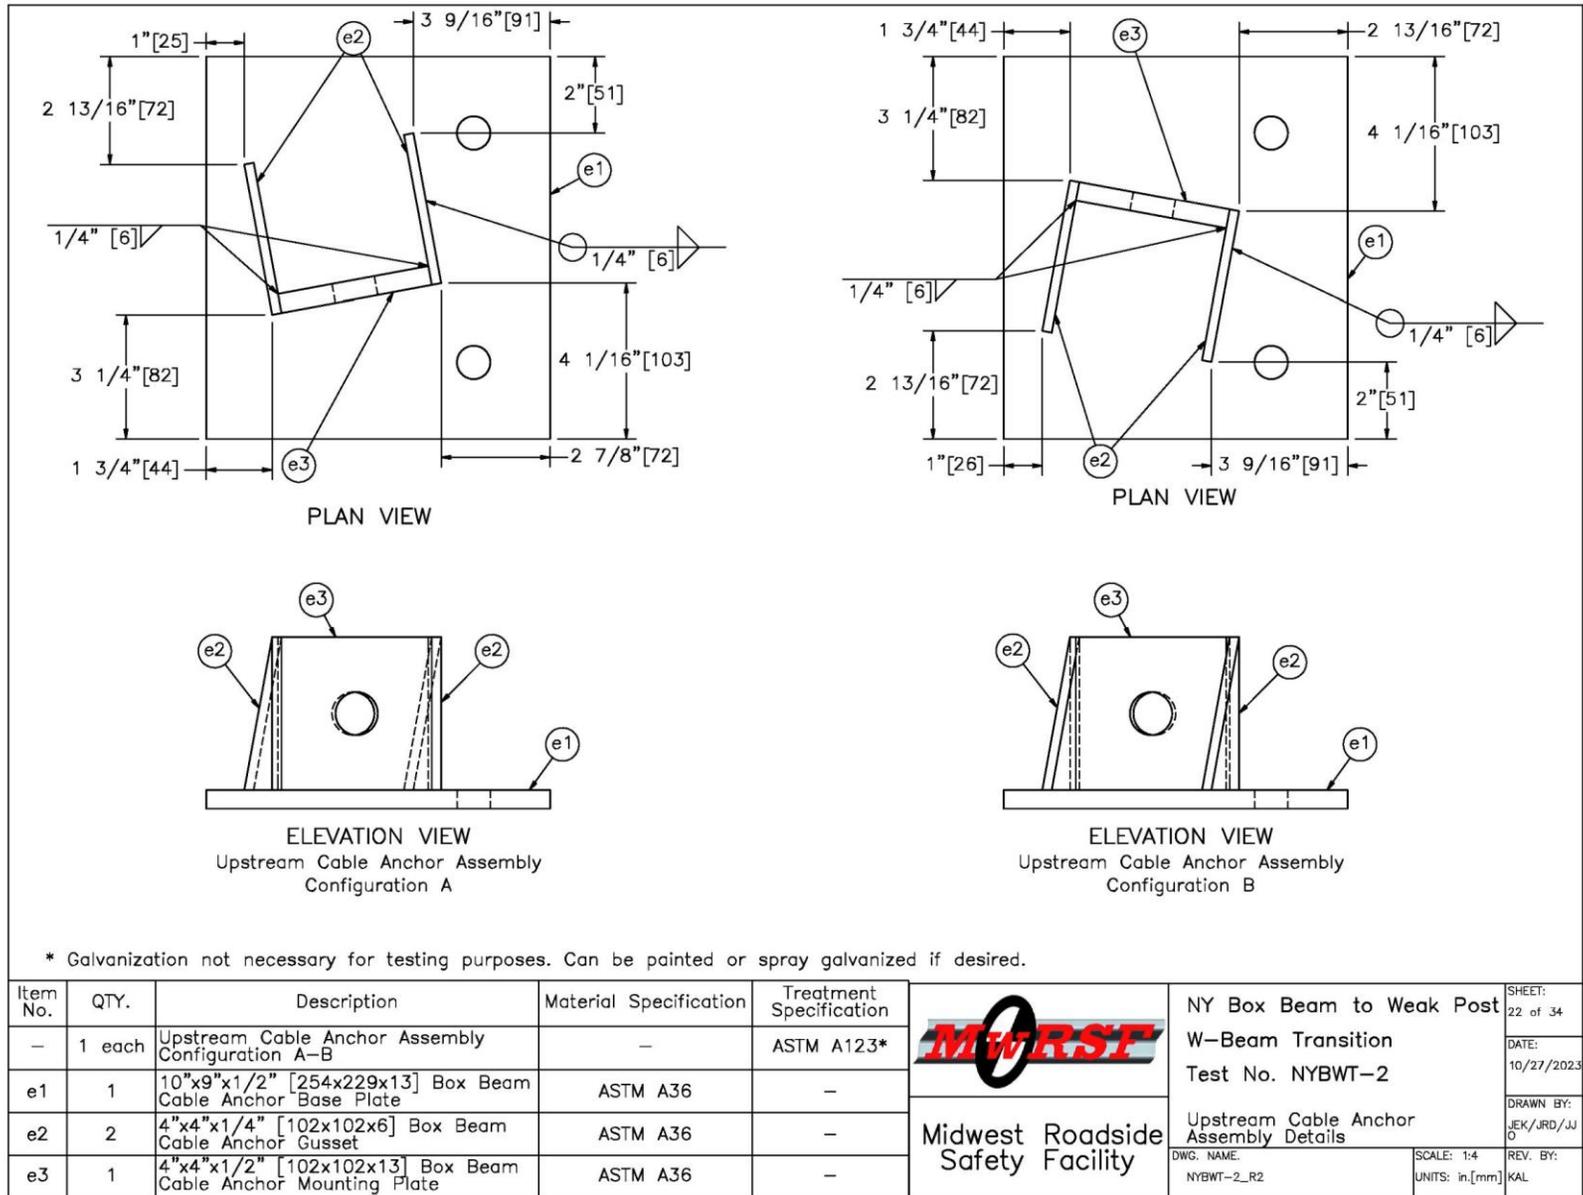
Upstream Cable Anchor Assembly Details Test No. NYBWT-2
